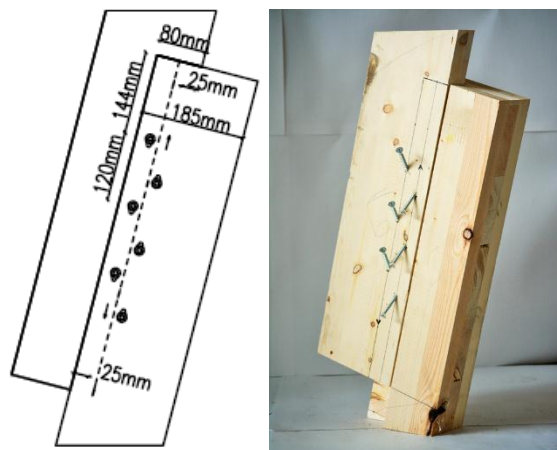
Half lap joints with STS in withdrawal (layout and specimen)
